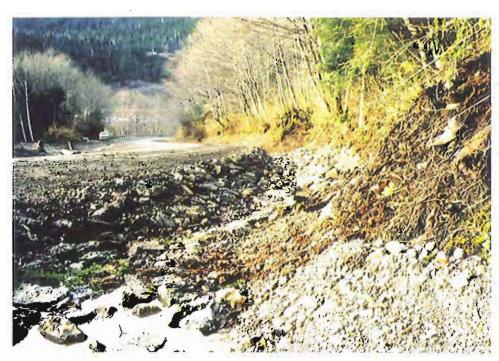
Looking down the Sawmill Creek Road's upslope surface water drainage ditch from about Sta. 3+80', showing the large rock placed in the ditchline to prevent erosion of the protective rock cover over the underlying 30-mil membrane liner, 11/11/99.
